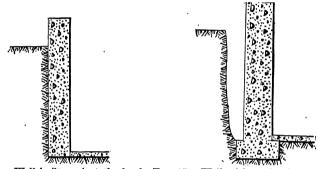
Wall built against the bank. Fig. 15.—Wall with projecting footing.
